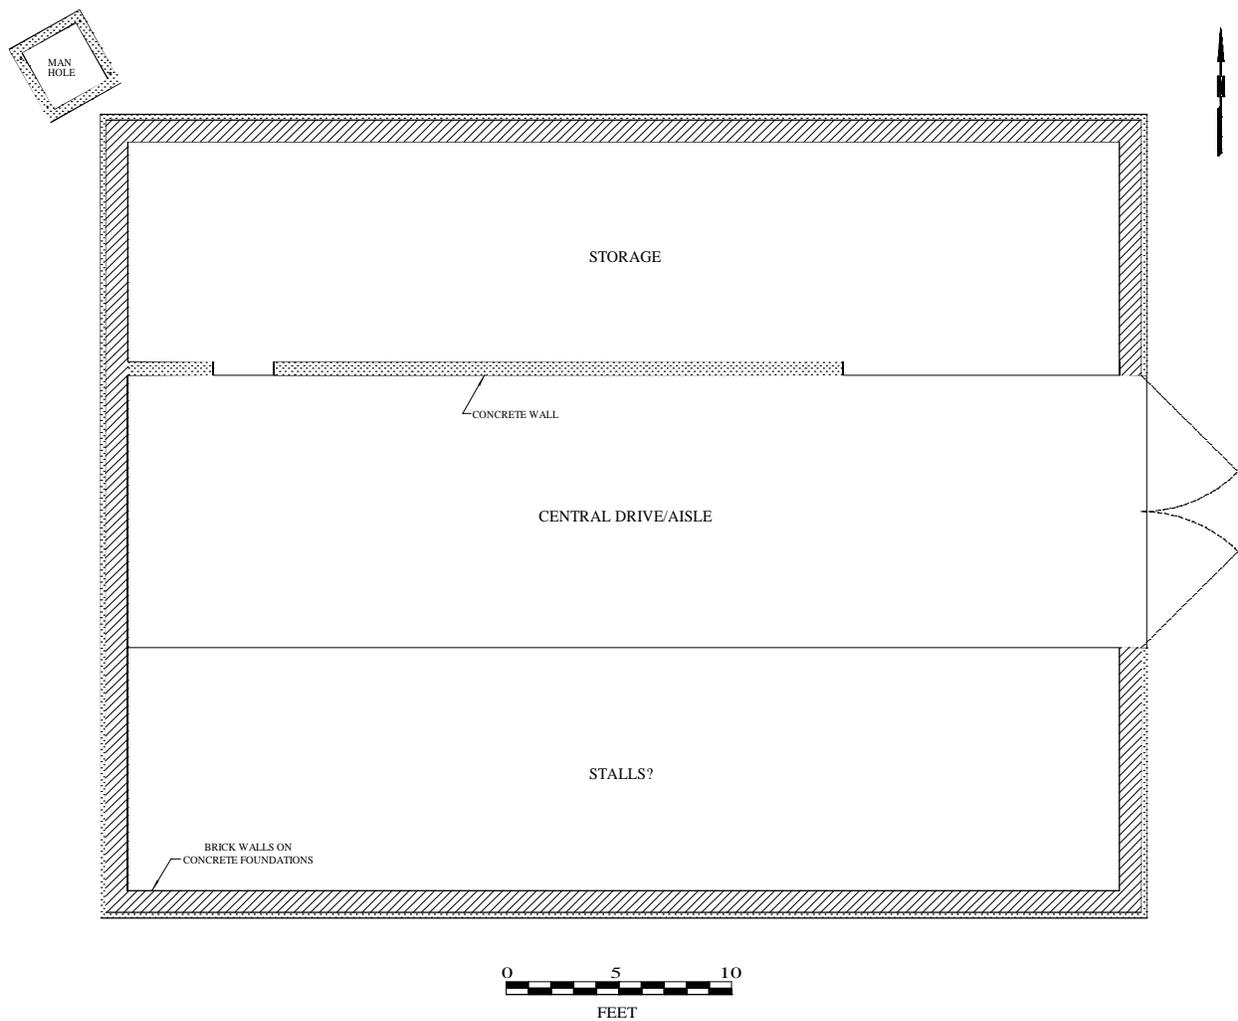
Floor plan of the stable (Feature 10) at the mine. Used to shelter mules, the stable was brick and was divided on its interior into three aisles (FRR February 2002).
